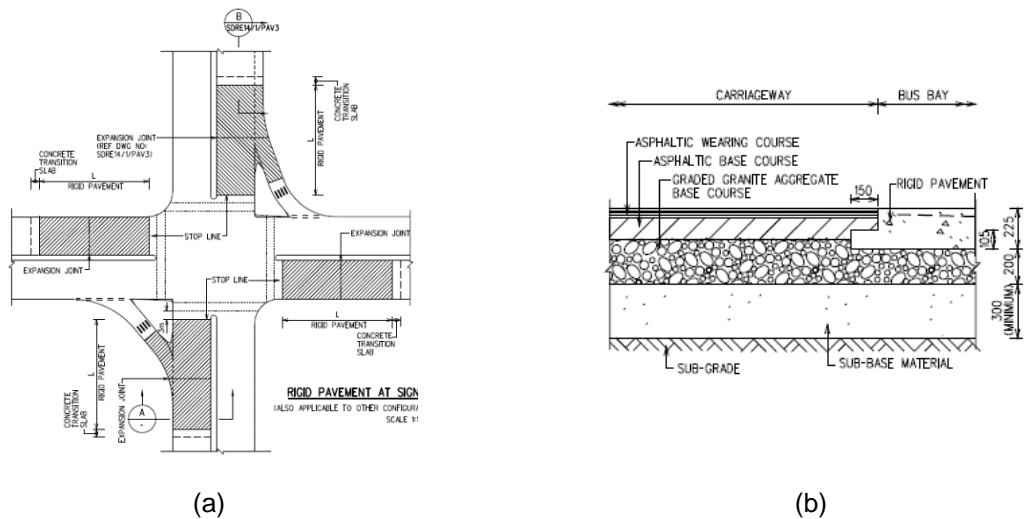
(a) Top view of pavement design at intersection, (b) structure for bus bay
